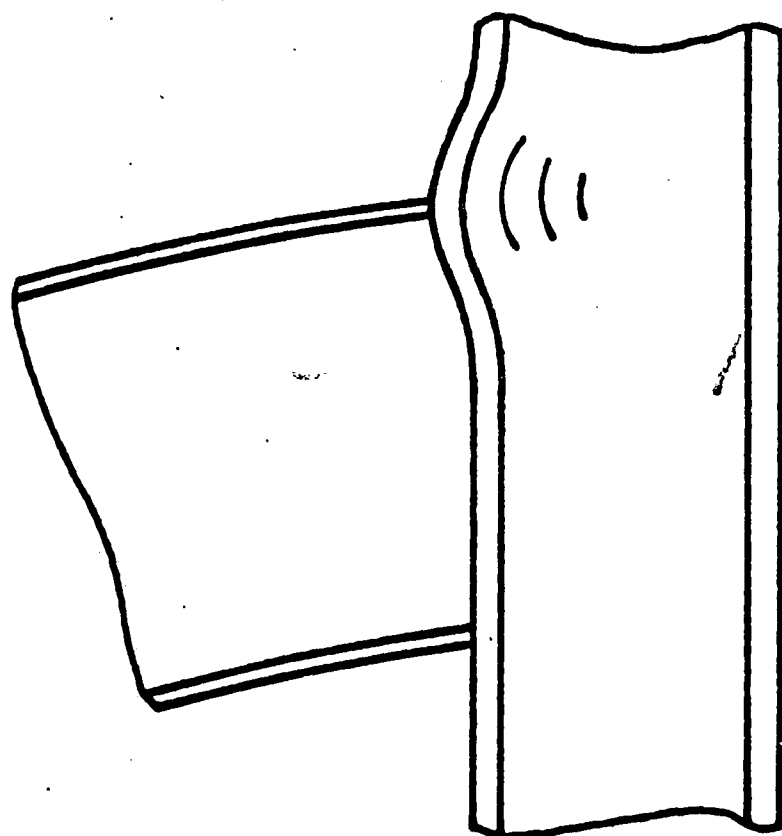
An Exploded View of an Exterior Beam-to-Column Connection Subjected to a General Loading
